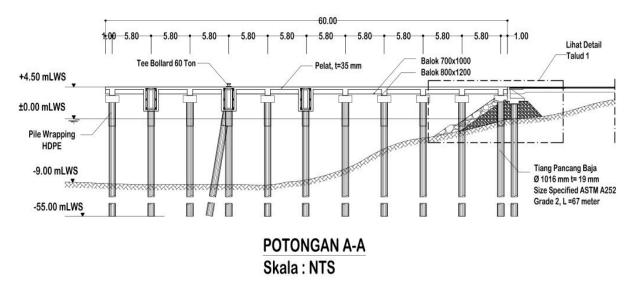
Post-construction cross section of construction jetty (not to scale).
